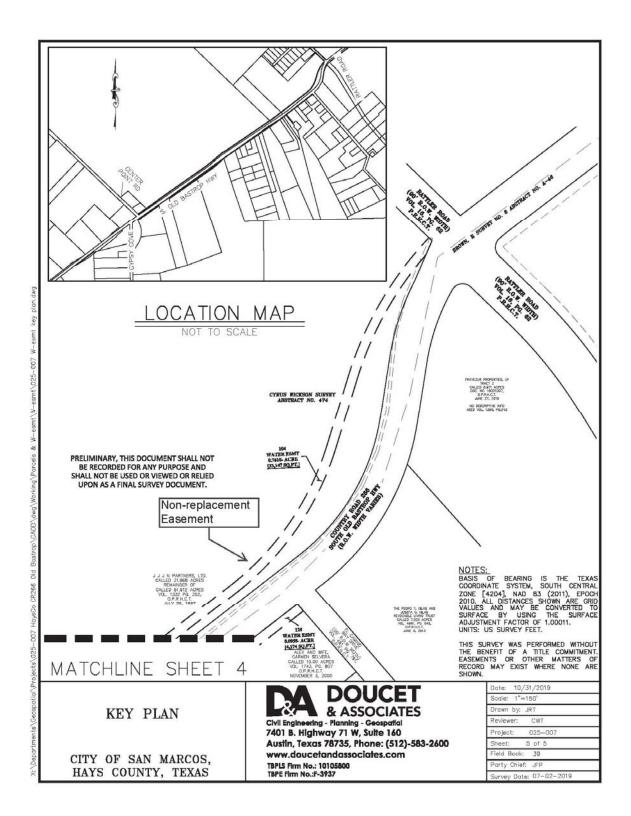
EXHIBIT C EXISTING AND PROPOSED EASEMENT LOCATIONS
